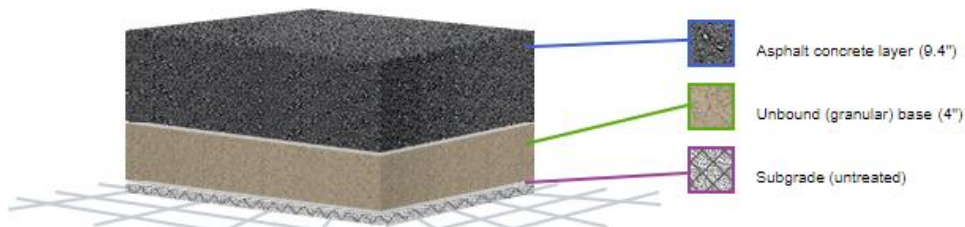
Pavement Structure for AZ-260 Section (Source:InfoPave).
